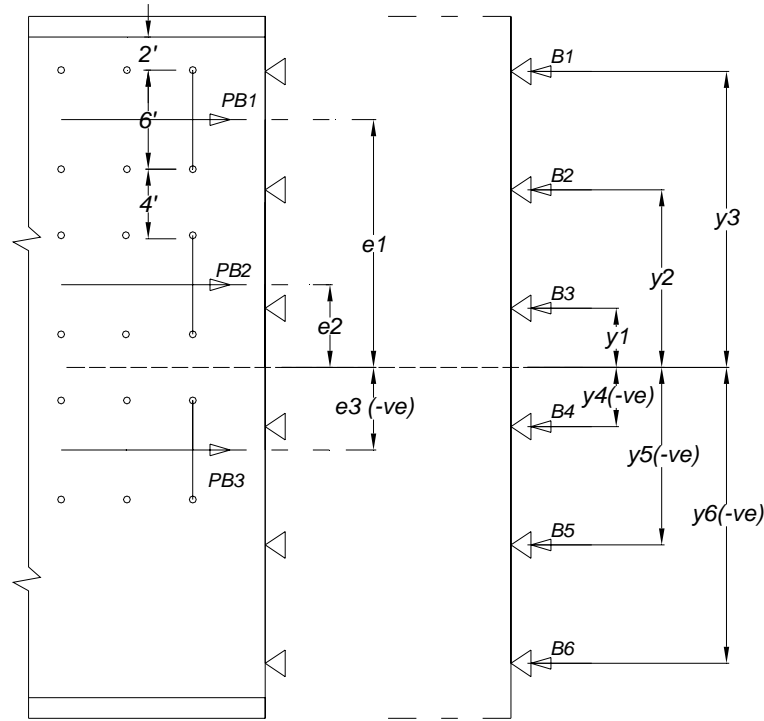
Girder reactions due to breaking force acting on a bridge deck for three lanes loading.
